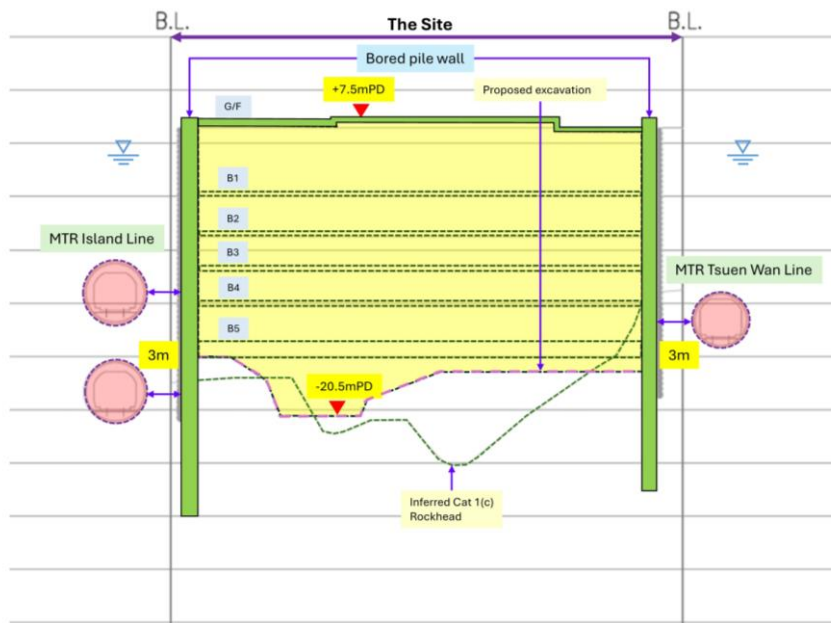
Section of Deep Excavation Works at Murray Road Site, Central
